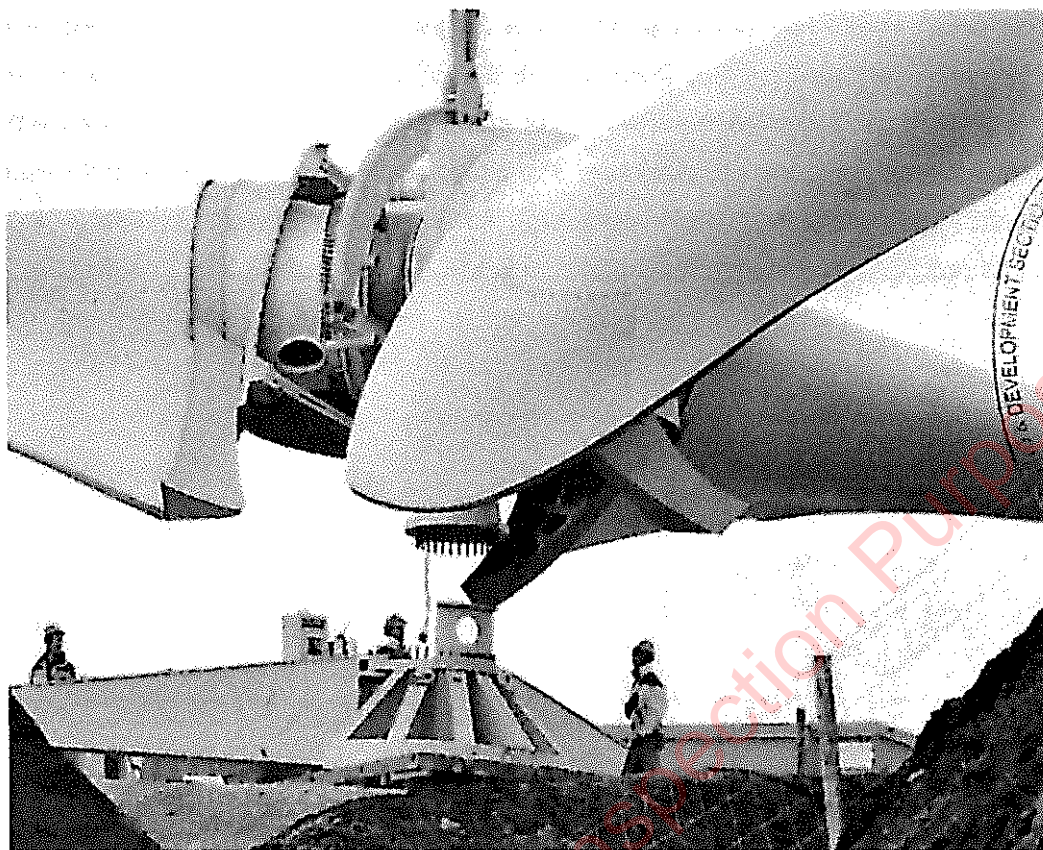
Assembly of Wind Turbine Blades ⁷
